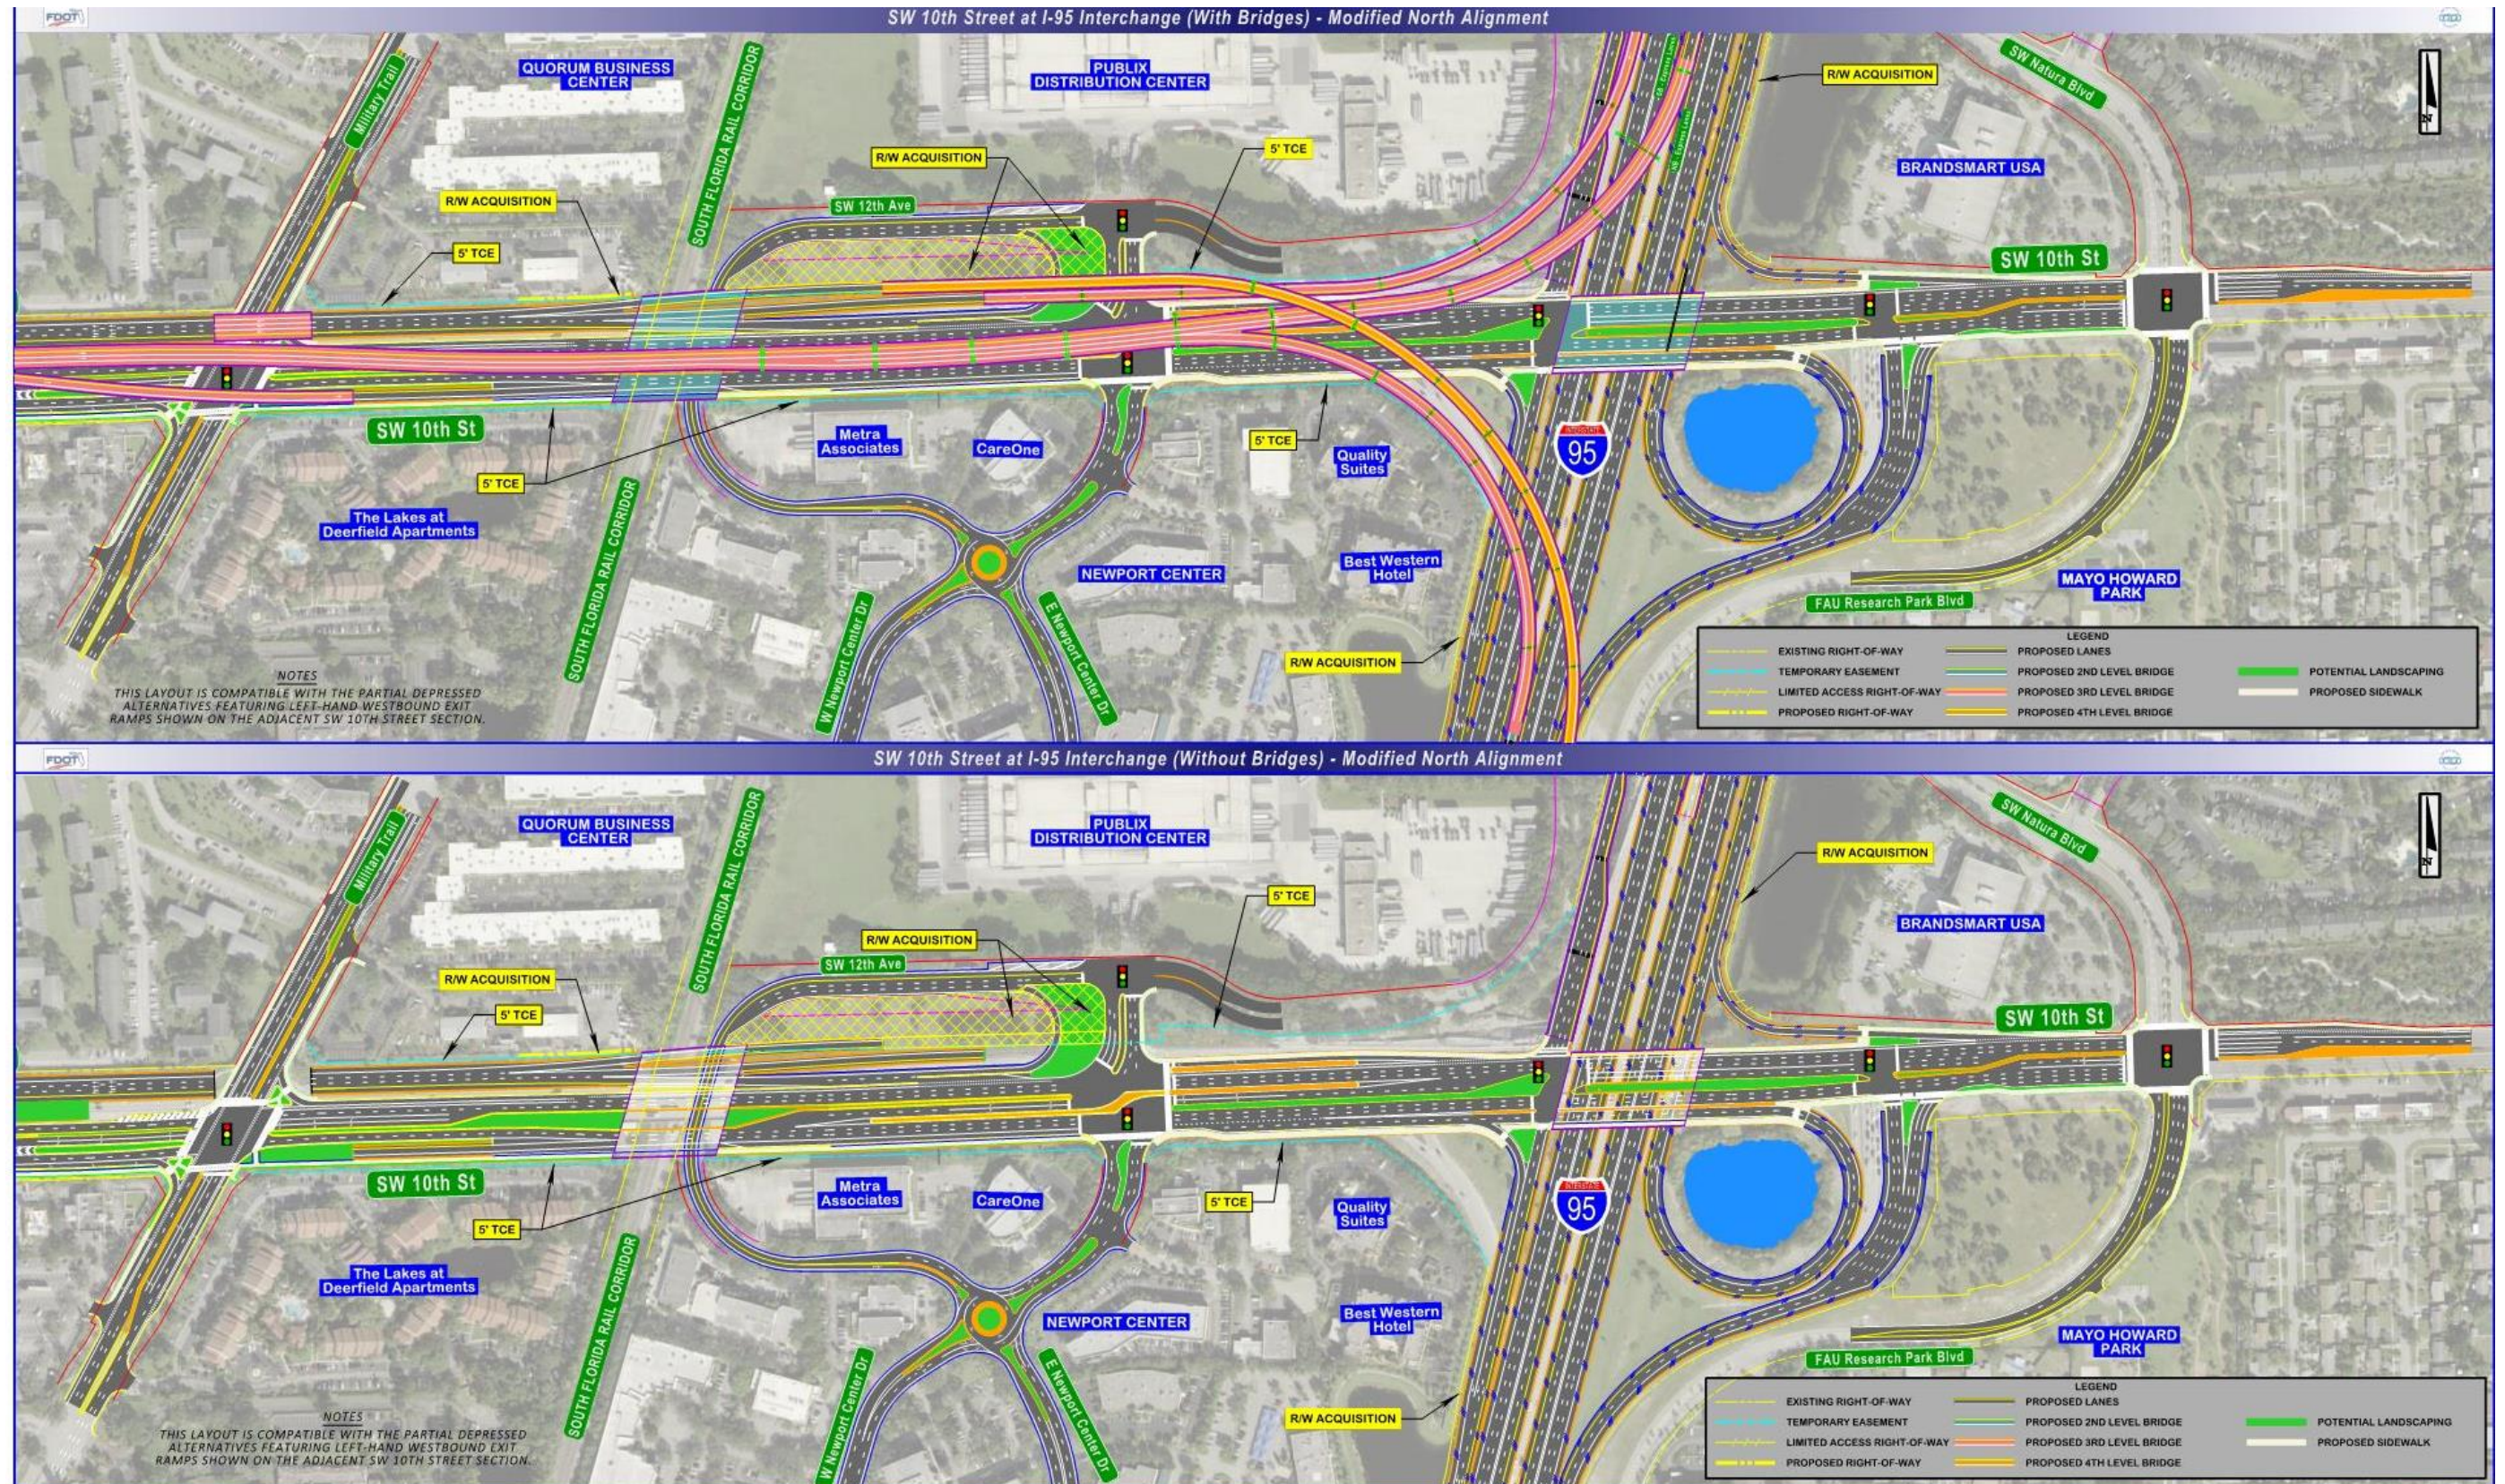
5: SW 10th Street - North Alignment Concept Plan
